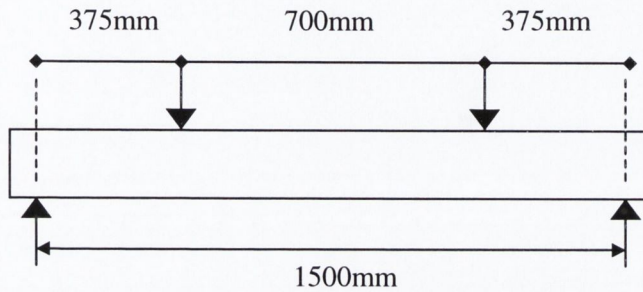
1/4 Point loading arrangement (Test Series 3)
